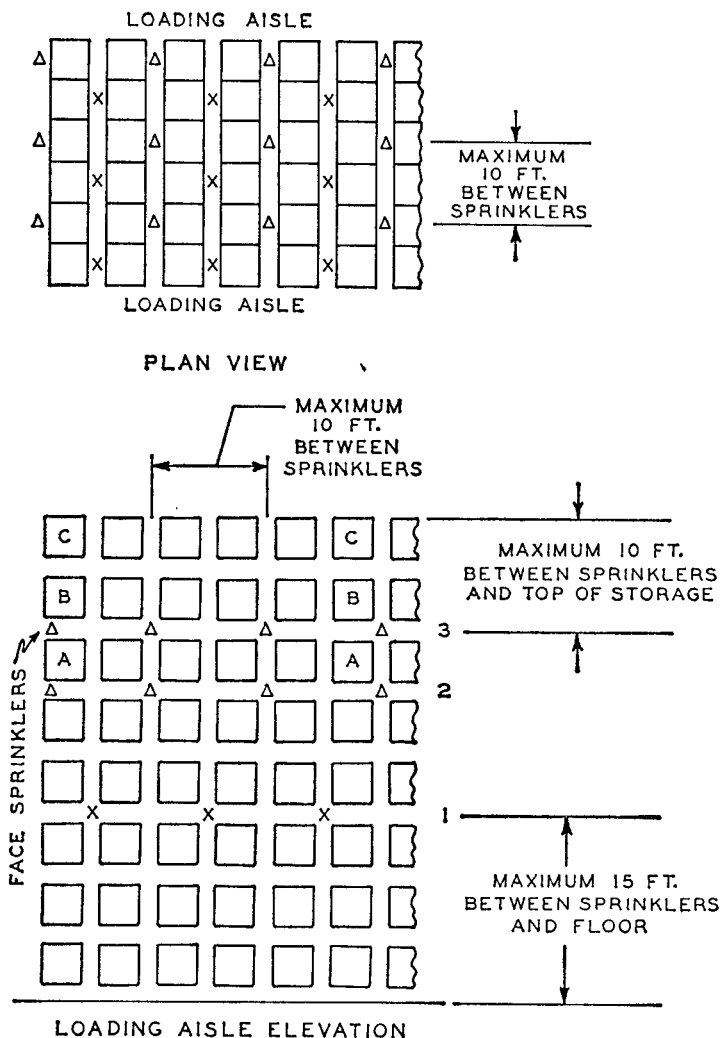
In-Rack Sprinkler Arrangement, Class IV Commodity, Multiple Row Racks. Height of Storage over 25 Feet.
